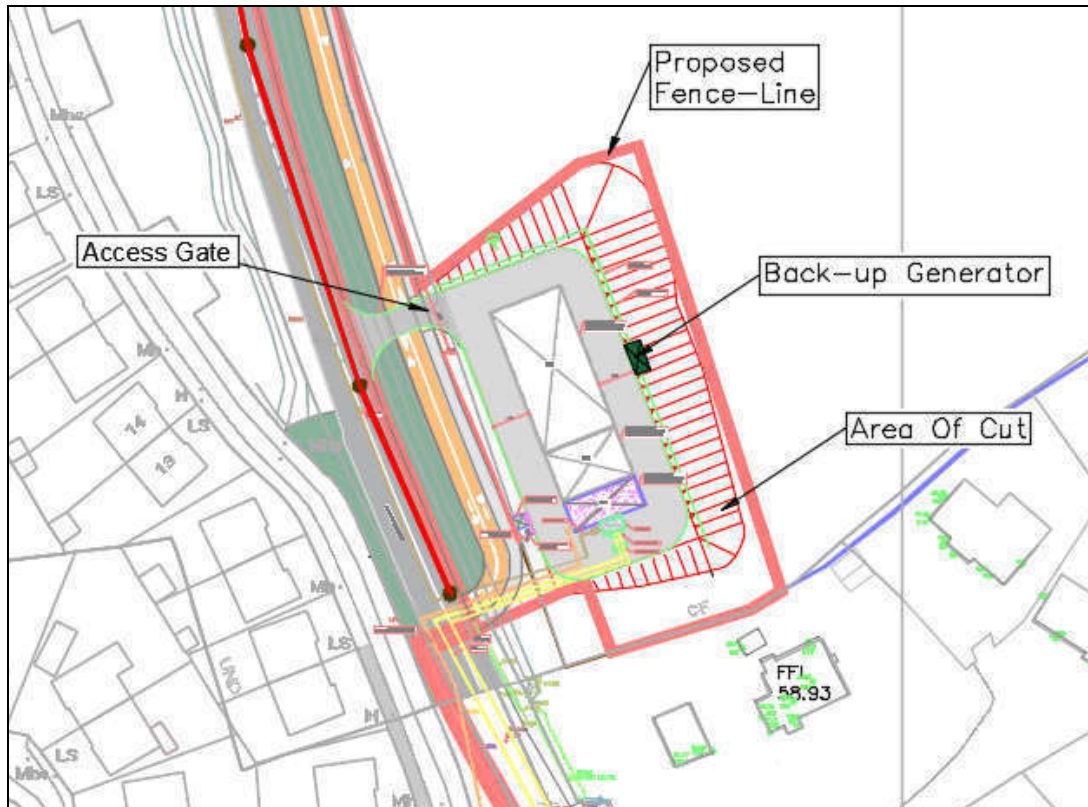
Ballyhooley Road Pumping station detail (For full details refer to drawing LHD-IWPS-P01)
